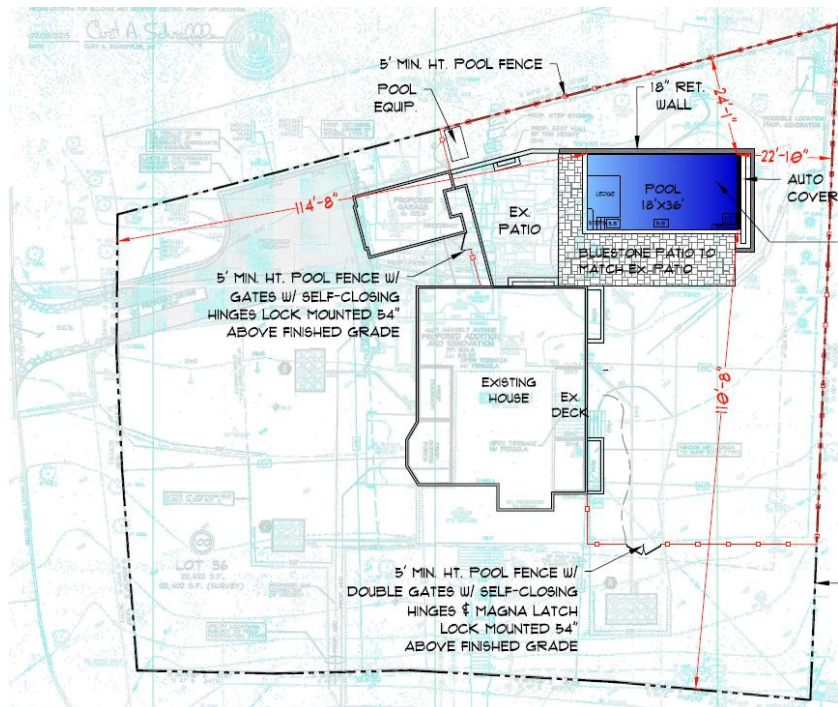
Proposed site plan showing the location of the proposed pool and patio.
